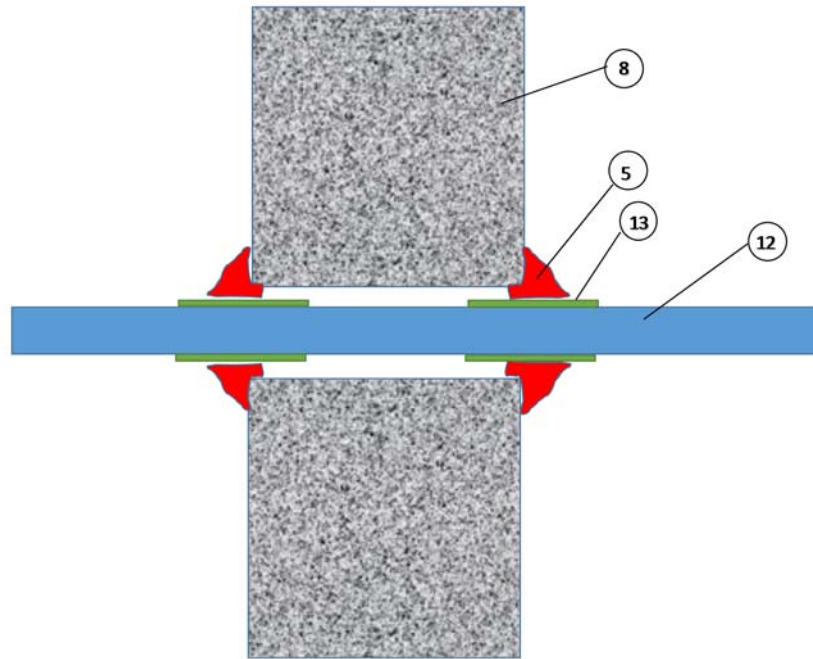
Typical detail for wrapped conduits for concrete or masonry
